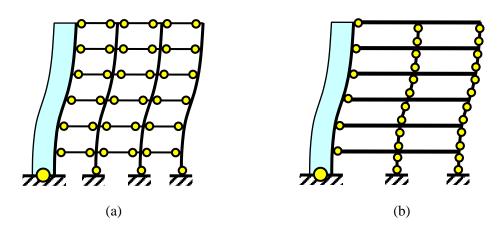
Preferable energy dissipating mechanisms for dual system with a (a) weak beam / strong column arrangement and (b) strong beam / weak column arrangement
